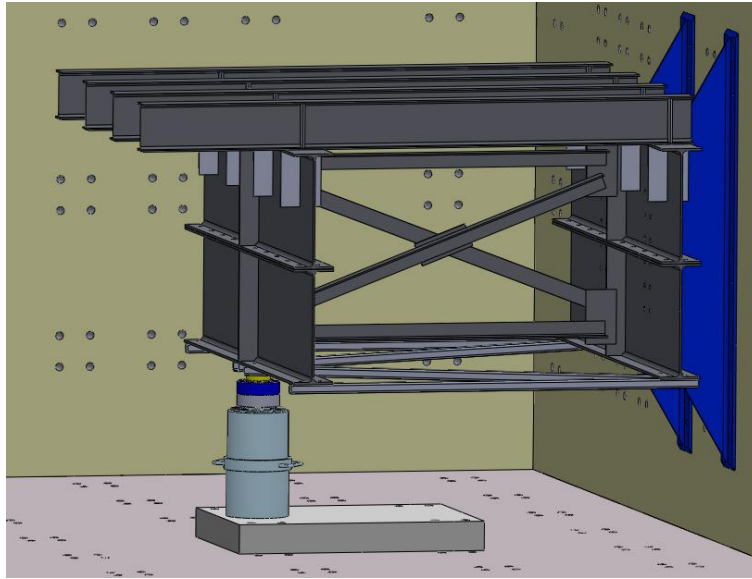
CAD Drawing of Cross Frame Fatigue Setup
